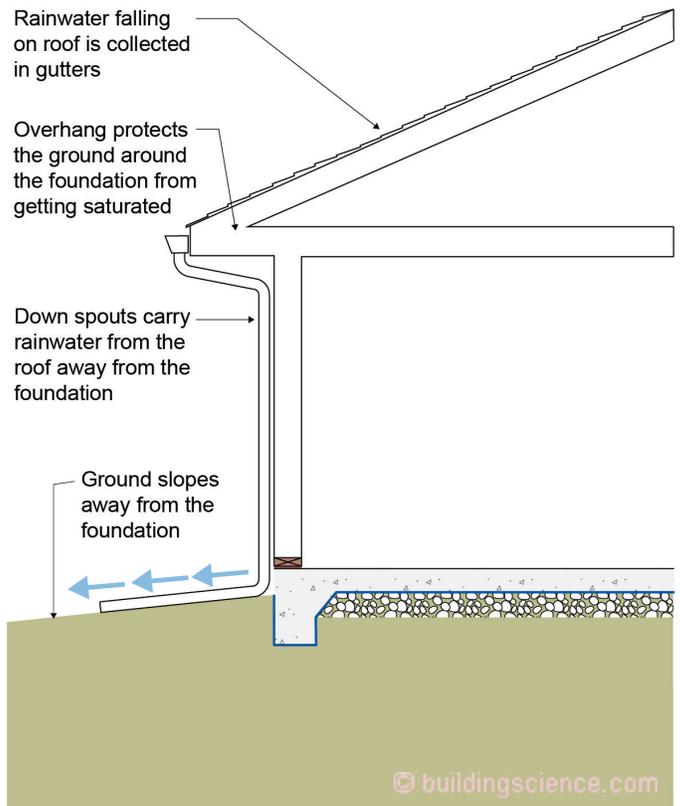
Gutters and Downspouts - Don't make surface water become groundwater beside your building.
